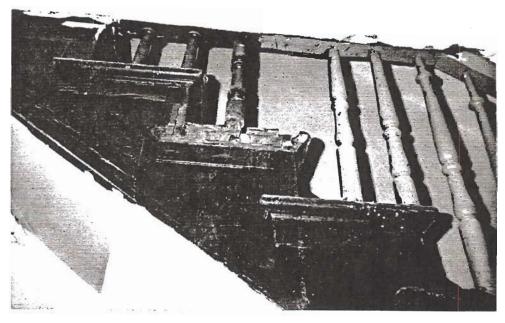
Basement: Damaged Wood Railing and Stair.
